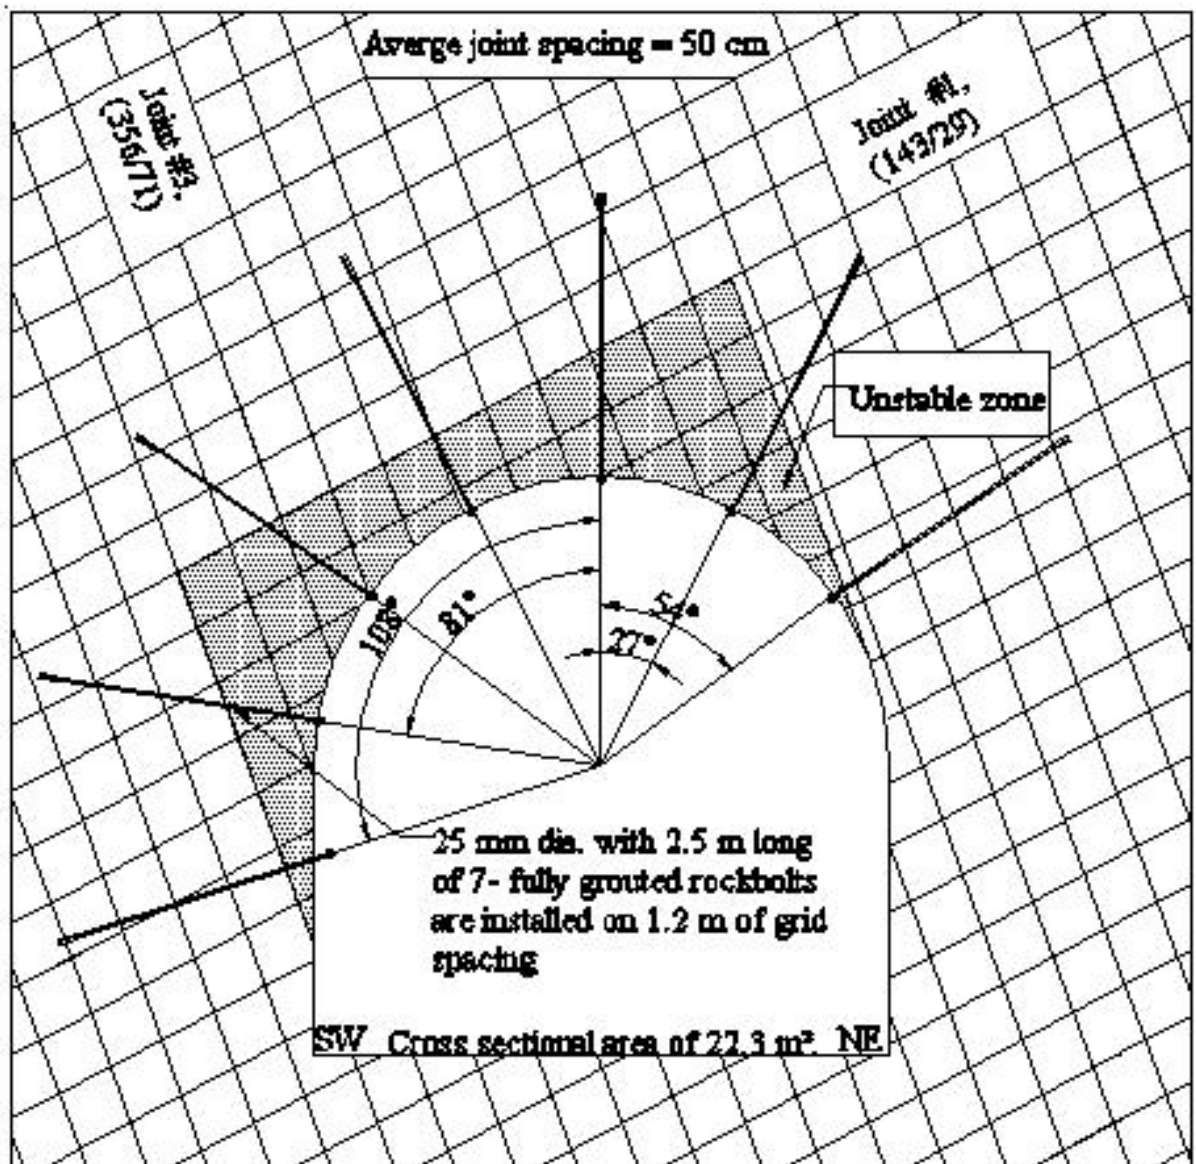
Preliminary layout of rockbolt pattern in access tunnel in footwall limestone zone.
